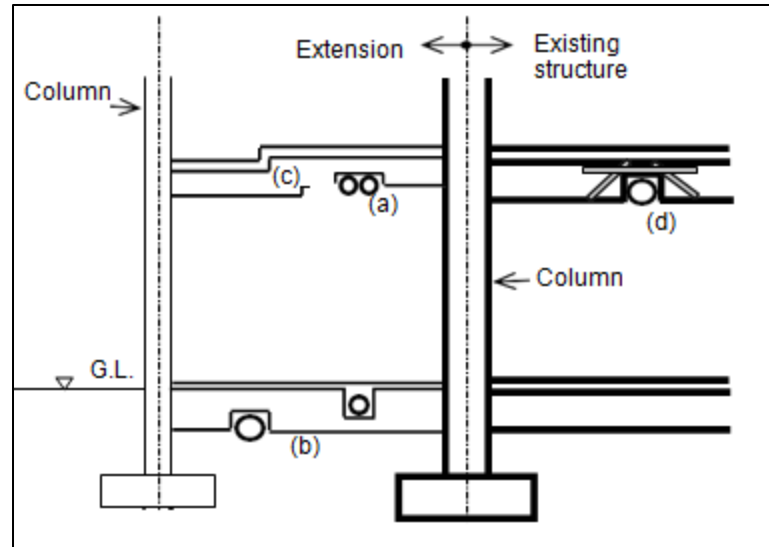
Examples of Recess Beams: (a) Floor Beams; (b) Ground Beam; (c) Stepped Beam; (d) Retrofitted Beam [24] .
